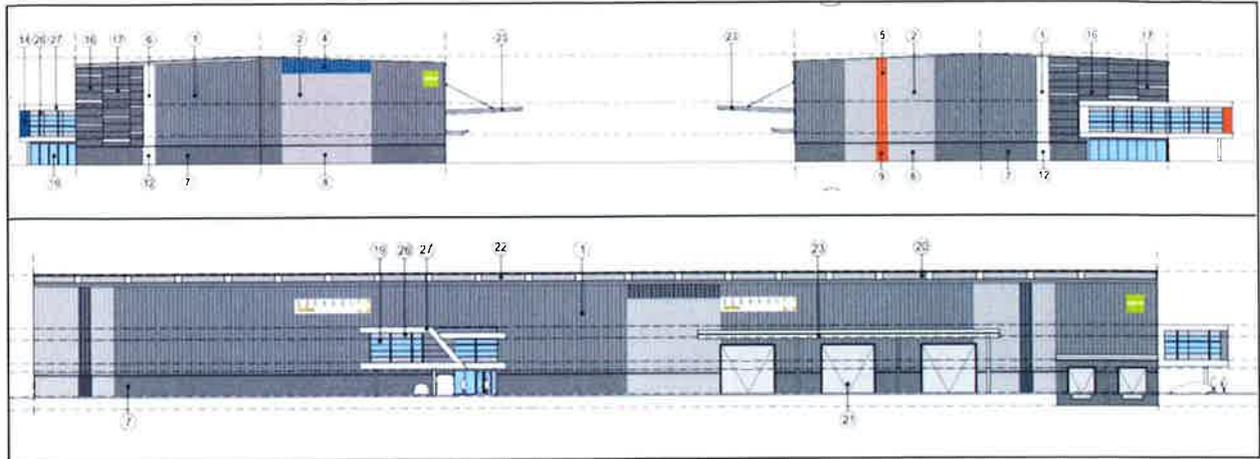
Approved (top) and proposed (bottom) western elevation of Warehouses 3A-1 and 3A-2
